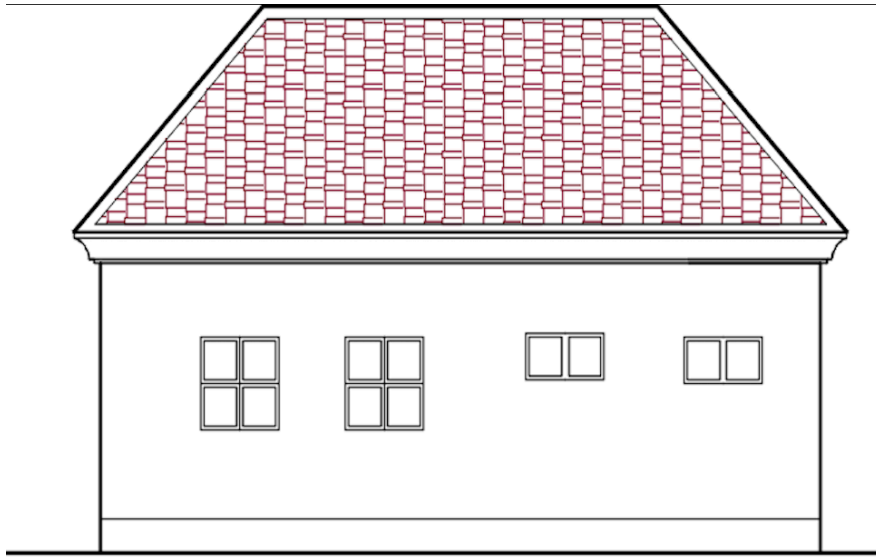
Detailed design of the switch room – right and top elevations (all dimensions are in mm)
